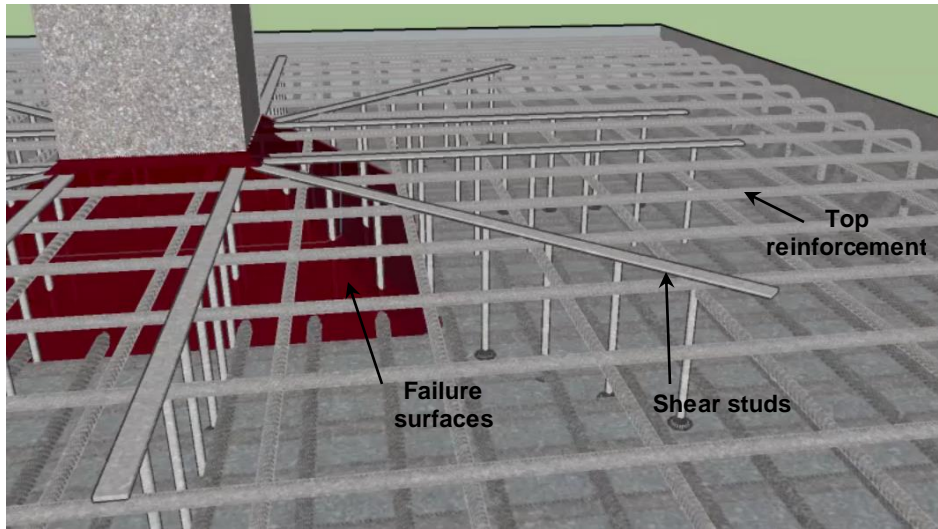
Failure surfaces in specimens with an orthogonal stud layout
